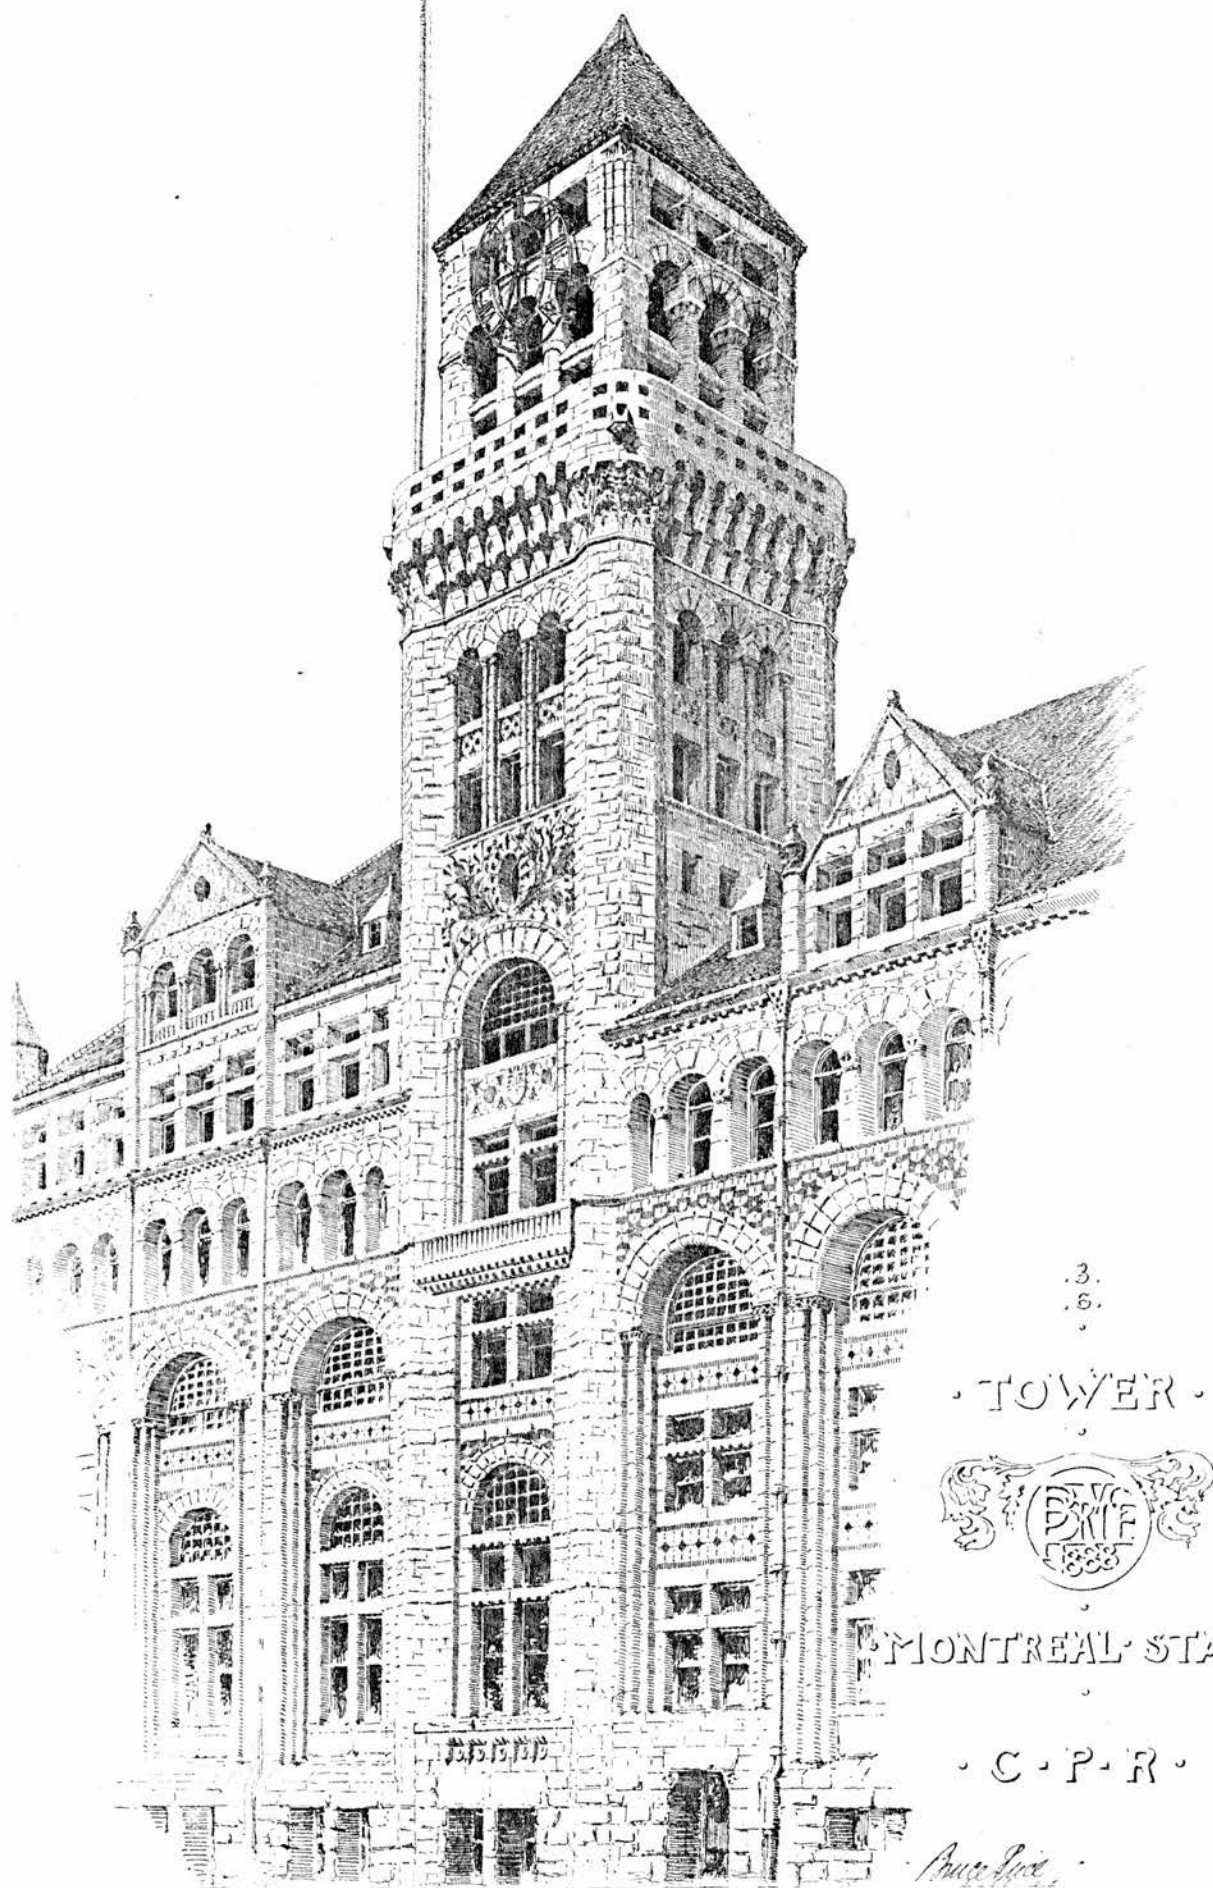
, Windsor Station, Montreal, detail, Bruce Price, architect.
